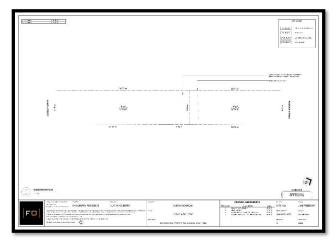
Proposed subdivision plan at 138 Addison Street, Goulburn
